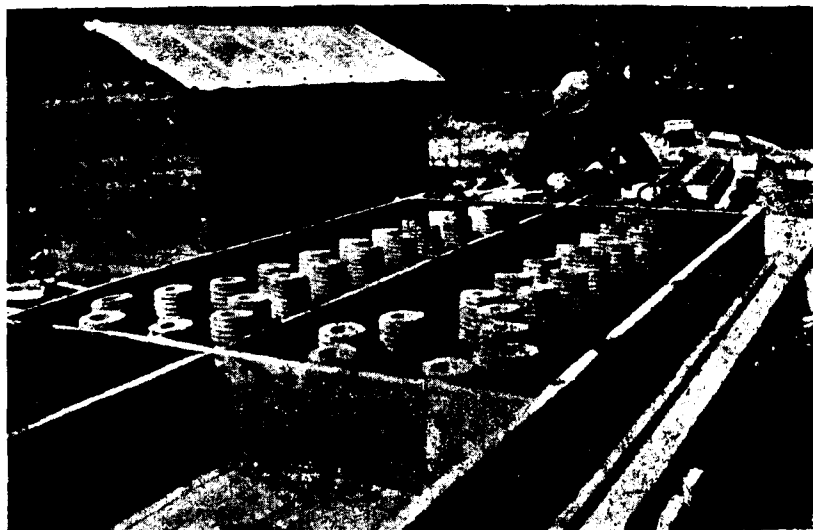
Abercrave Bridge—Making precast anchor blocks with Freyssinet cones built in.
